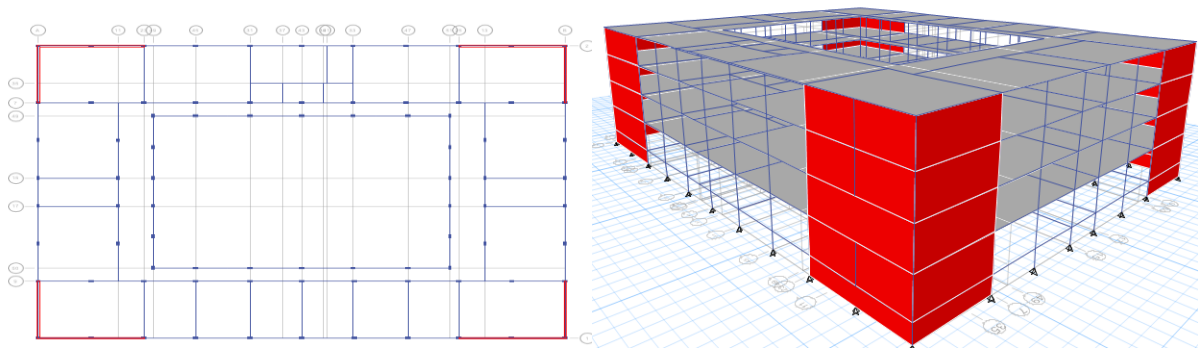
Elevation plan & 3D view for 20% slab opening with shear wall at corner.
